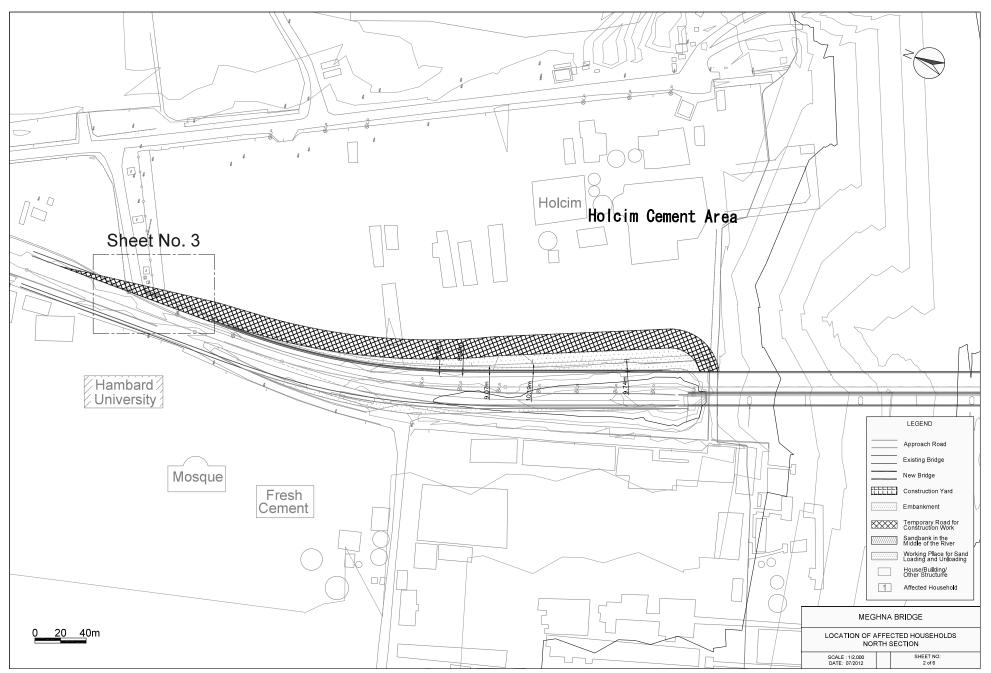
Location of Affected Households North Section (Sheet No.2)
